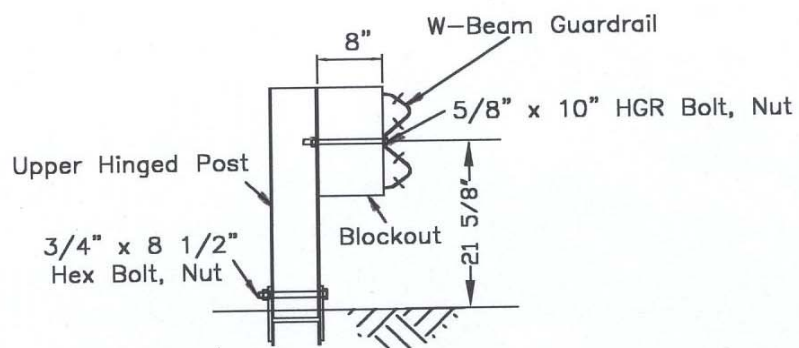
SKT Ground Strut Anchorage for Bolted Hinged Steel Post
